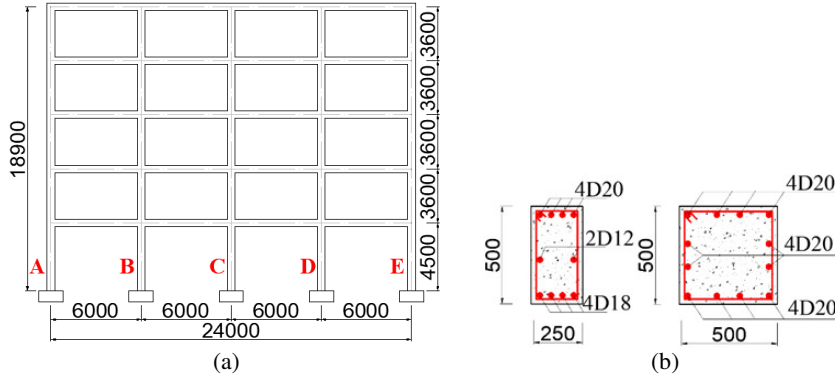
Layout of structural model: (a) RC frame; and (b) column and beam cross-sections (dimensions in mm).
